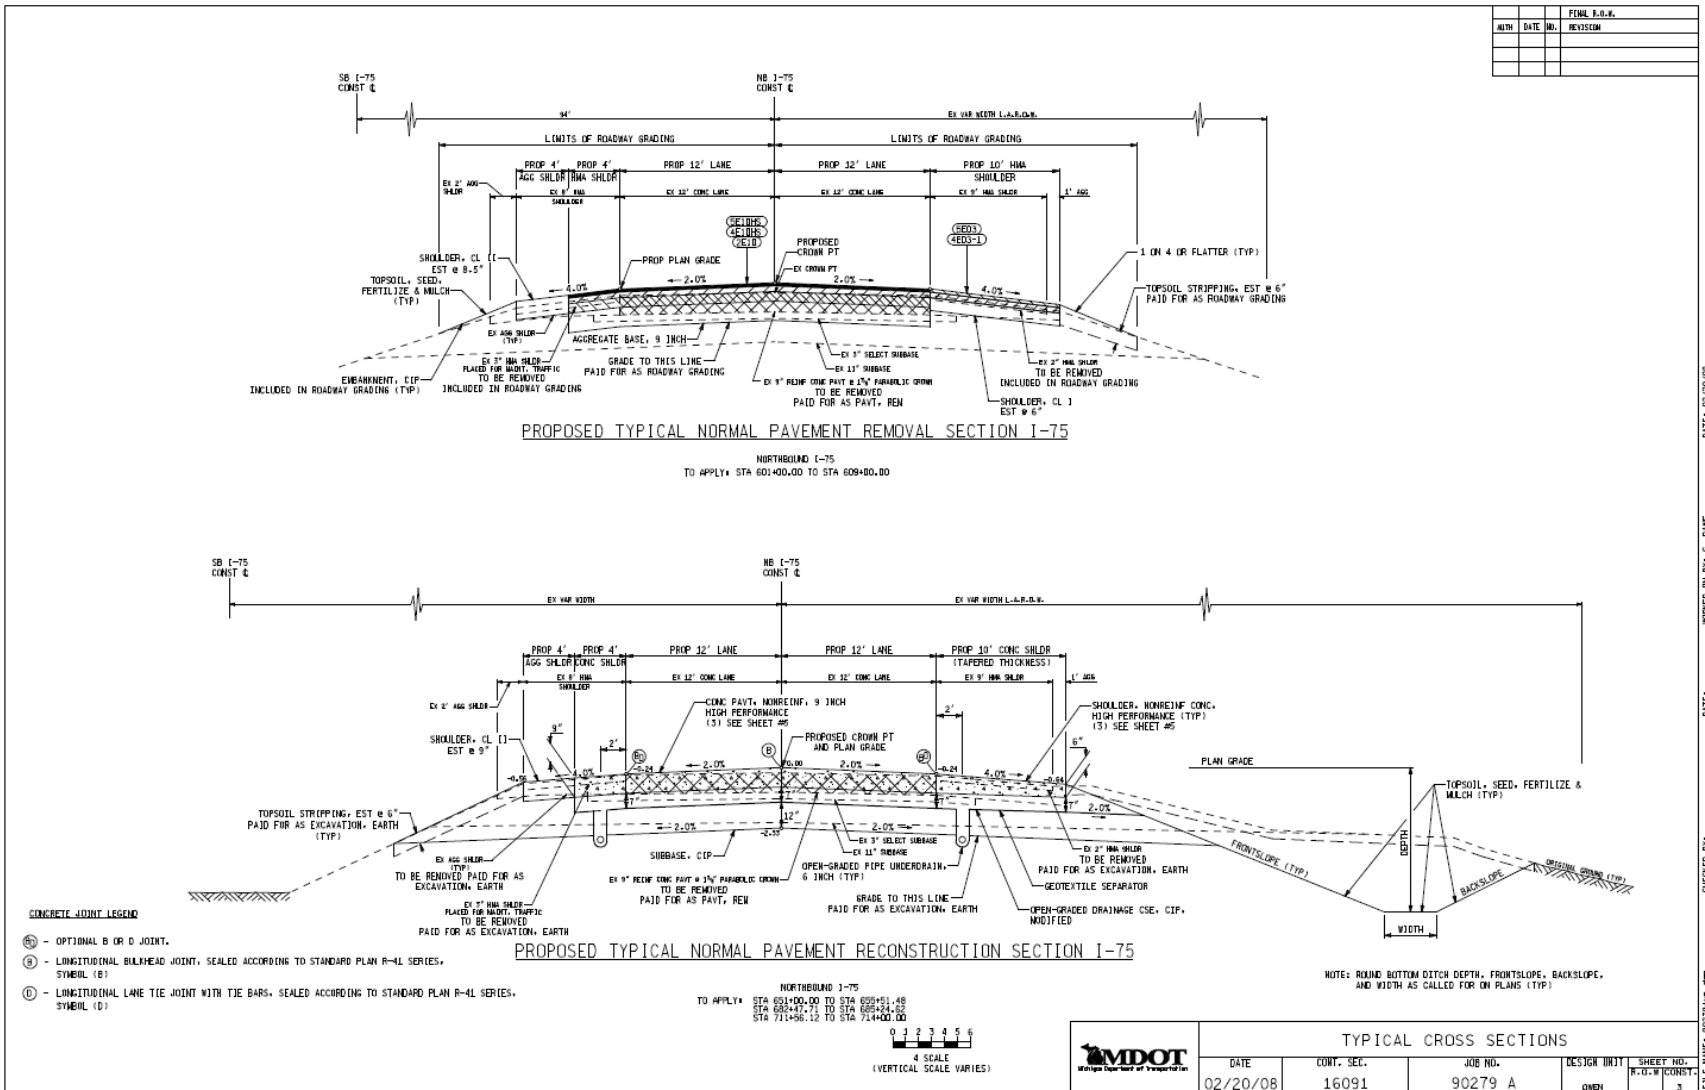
JN 90279 Typical Cross-Section for I-75 NB perpetual over rubblized concrete project: (upper one: pavement removal section, Sta 601+00 to 609+00; lower one: non-related to this demonstration project)
